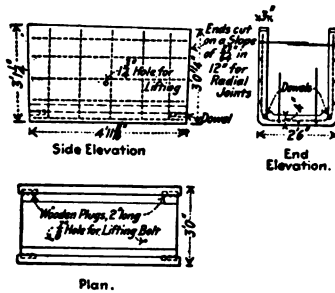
Details of Voussoir Blocks for Ribs of Belvidere Bridge.
